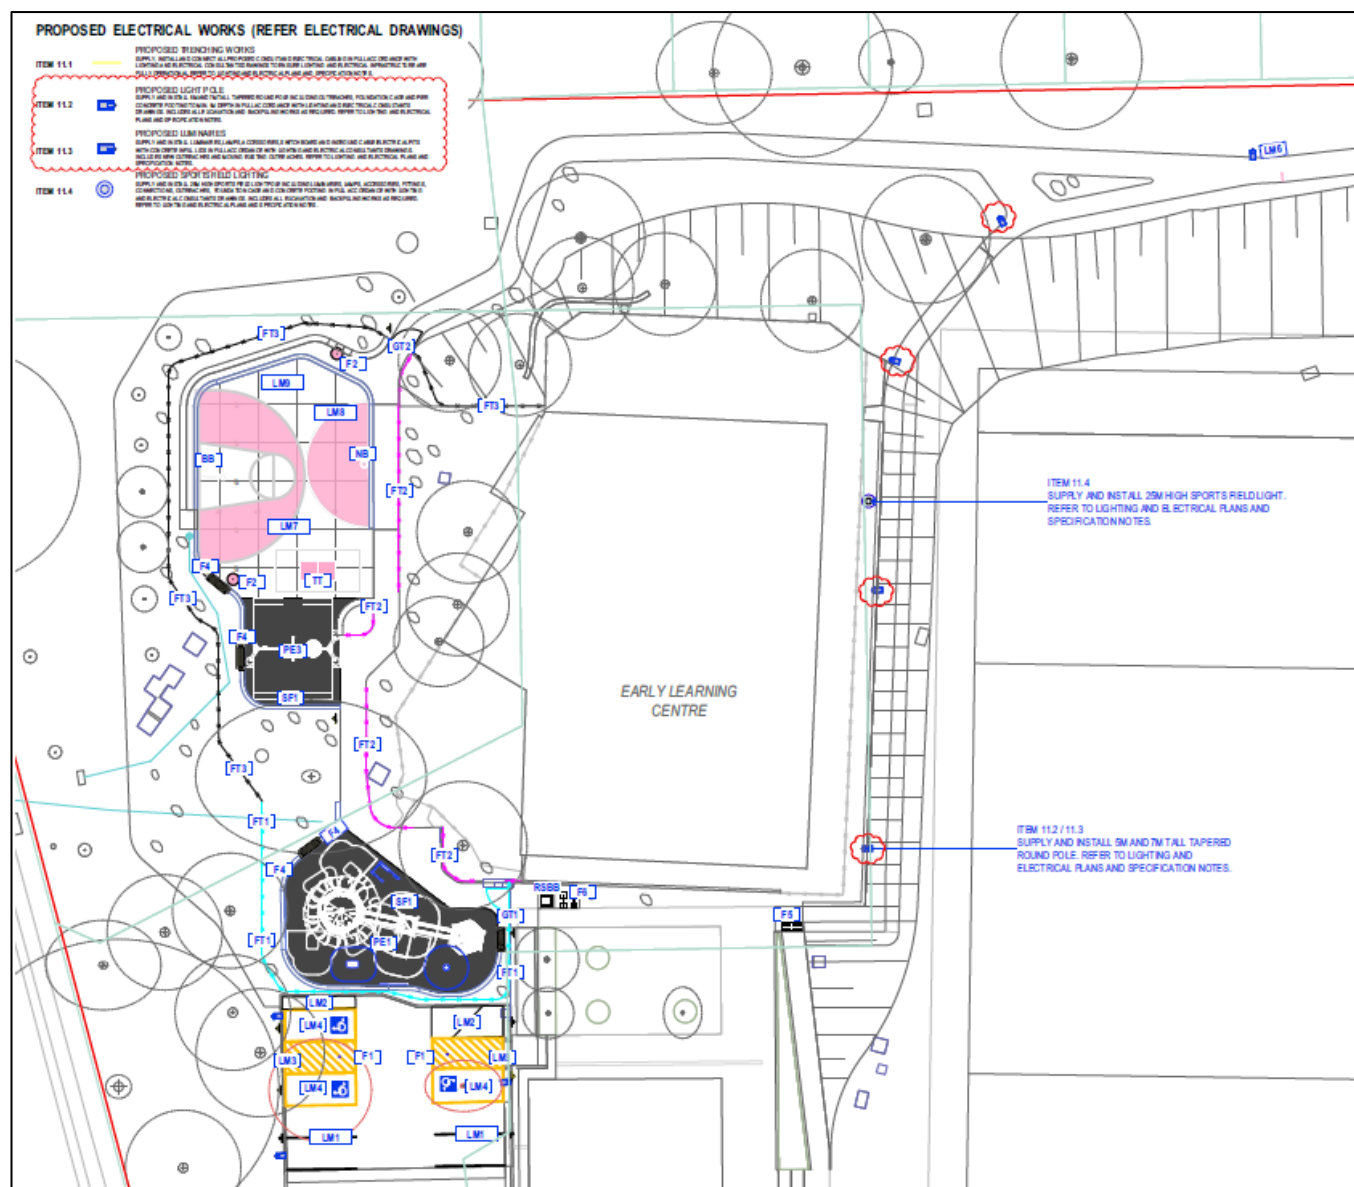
Extract from Proposed Playground / Multi Use Court Furniture Plan (Source: City of Parramatta, 2025)
